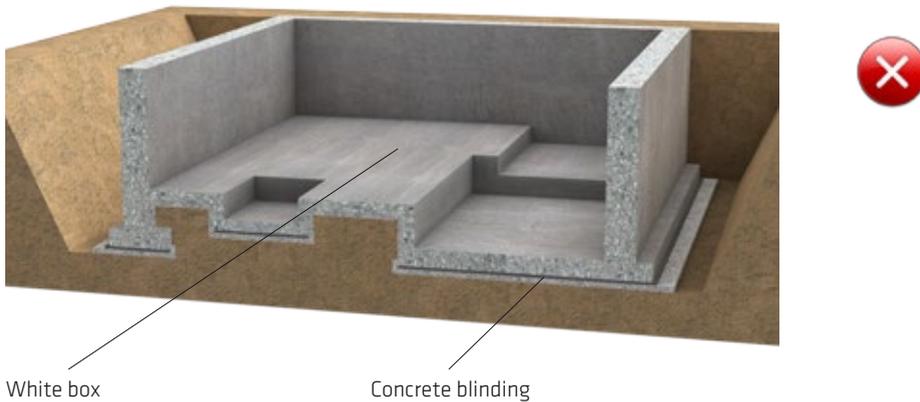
Traditional design of reinforced concrete base slab, not suitable for the Sika White Box concept
